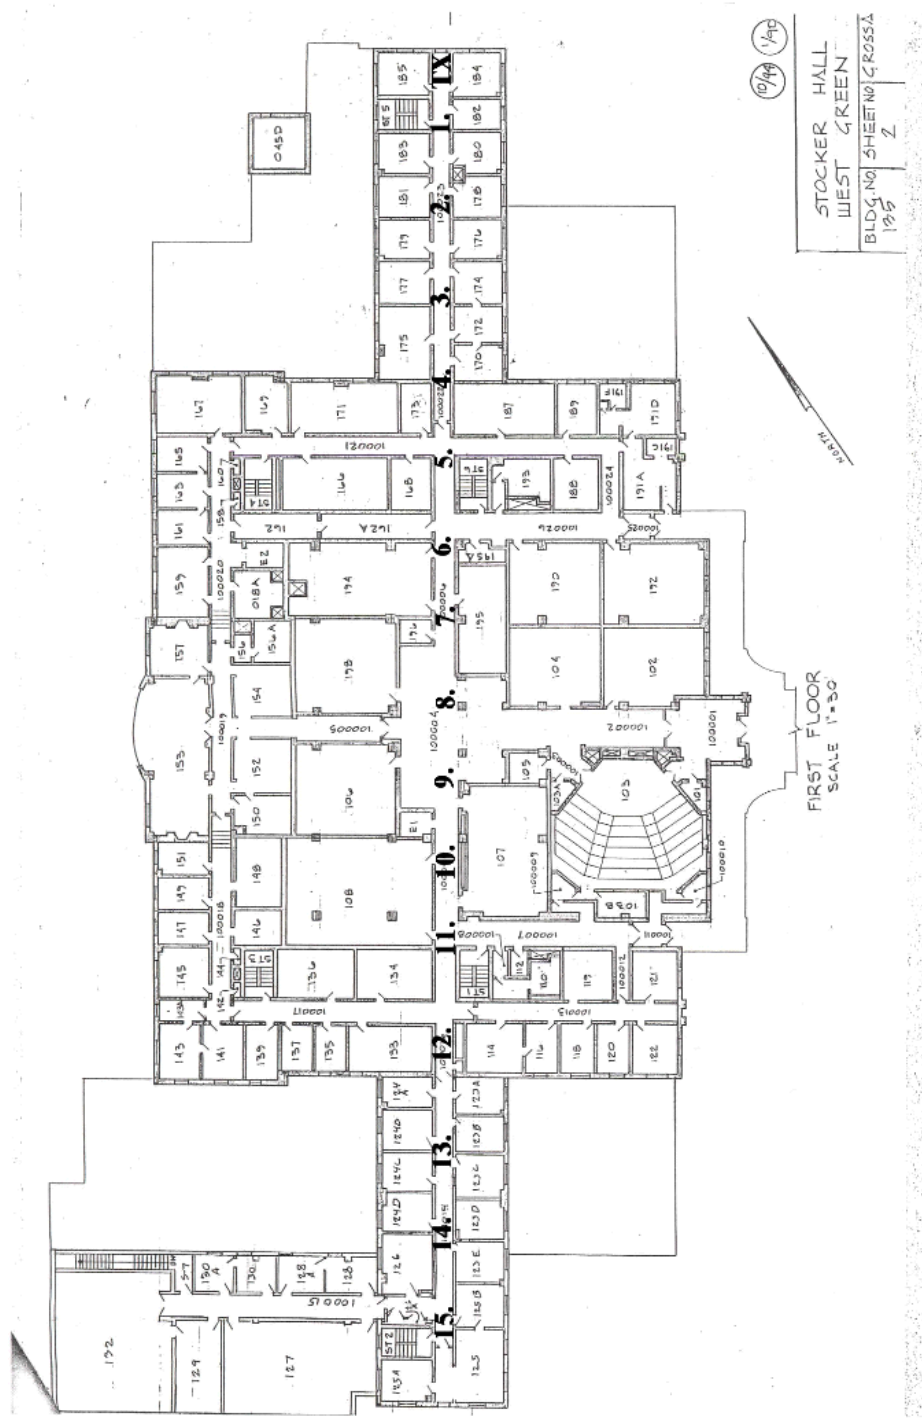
Layout of floor plan of first floor with transmitter and receiver locations.
